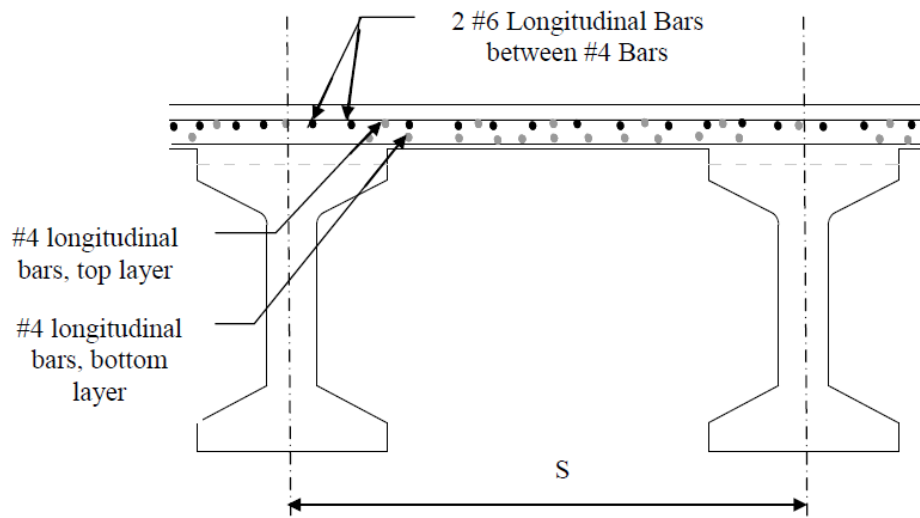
Section view at construction joint of current continuous bridge deck (SR 46 Over Oconee River) (Snedeker et al., 2011)
